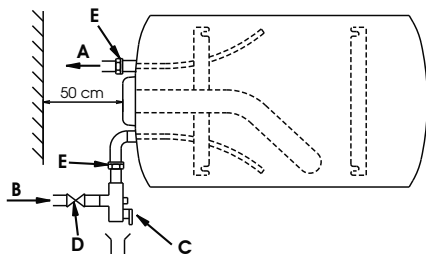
Horizontal element on the protection element - supply pipes on the right-hand side
